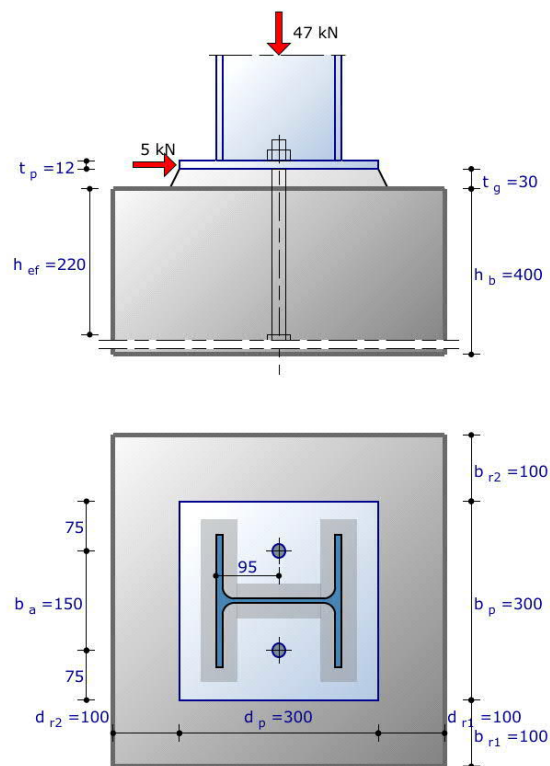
Anchor bolt design for steel column base plate connection to concrete foundation
